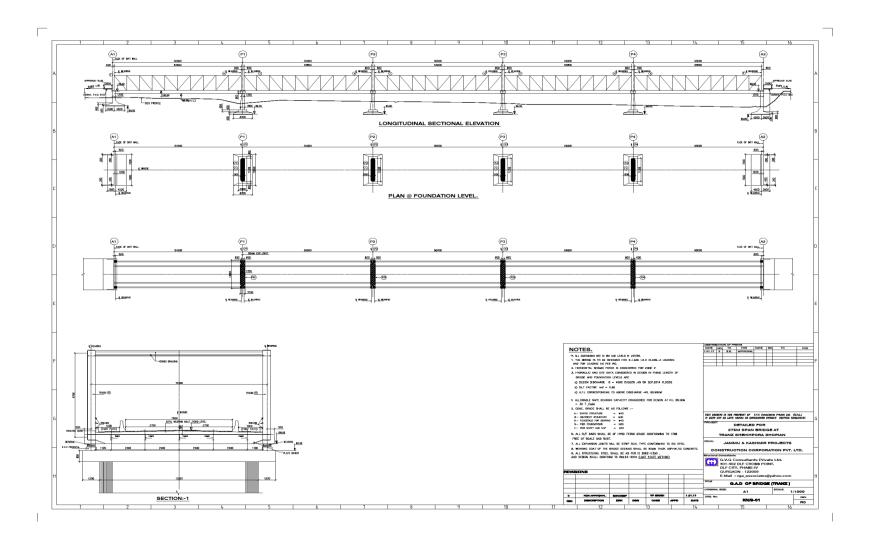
General Arrangement Drawing (GAD) for Proposed Bridge at Trenz
